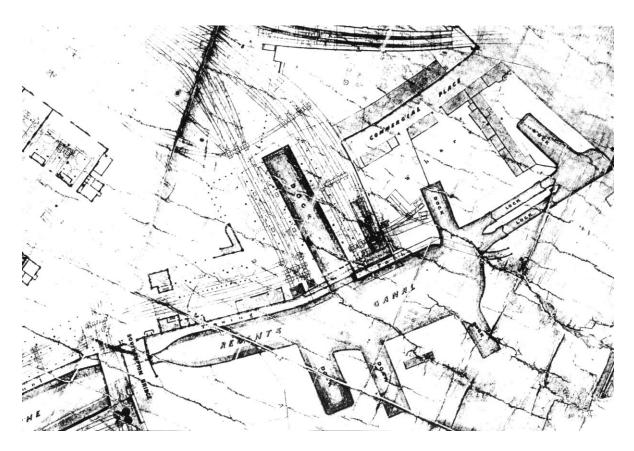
From 1856 site plan, showing new dock and interchange shed.
